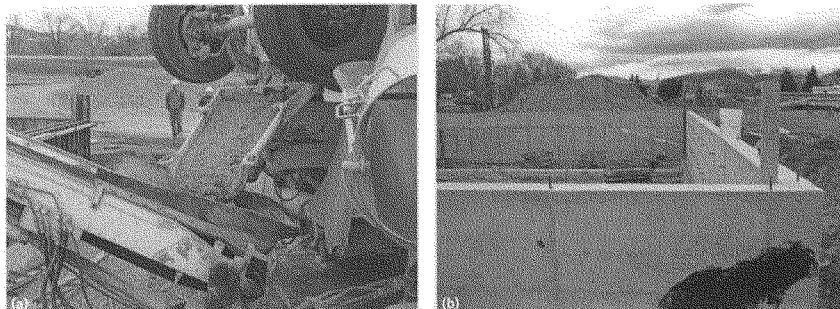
Construction of building foundation. Three loads were successfully transported 50 miles (80 km) to the job site: (a) discharging concrete to conveyor; and (b) completed foundation
